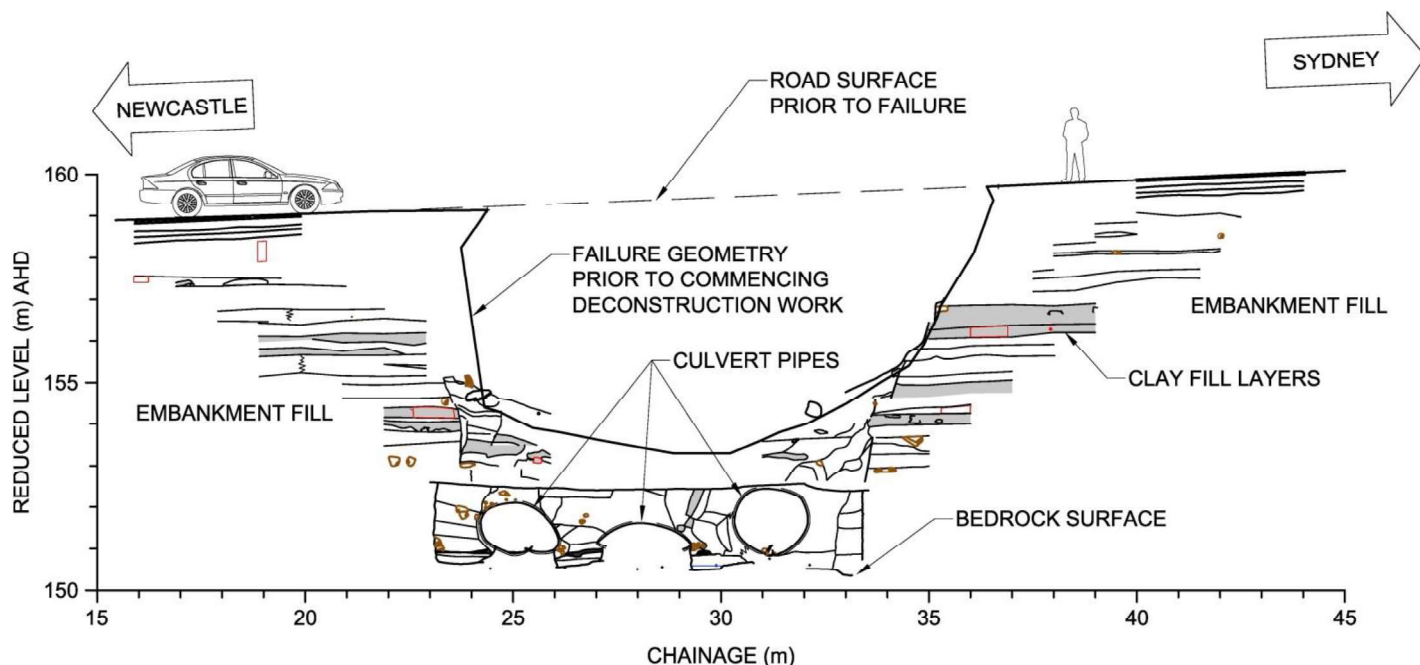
Section along the Old Pacific Highway showing the failure geometry and damaged culvert at Piles Creek.
